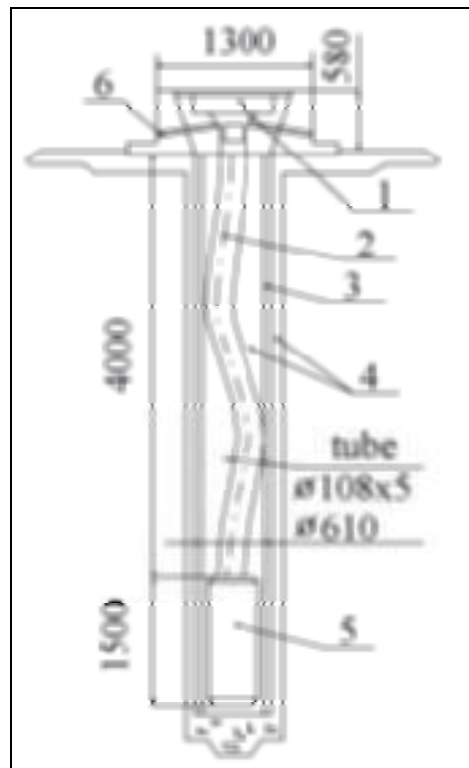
The design of the borehole at the RADON Disposal Facility (dimensions in mm). 1 – carbon steel conical socket, 2 – stainless steel loading channel, 3 – steel-enforced concrete well, 4 – concrete, 5 – stainless steel cylindrical vessel, 6 – drainage channel.
